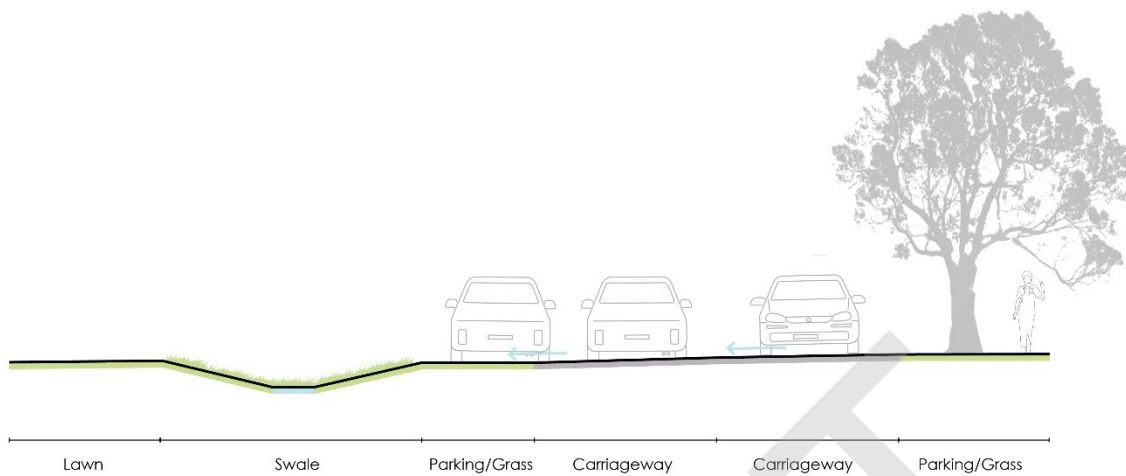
Potential roadside swale for stormwater conveyance and to encourage soakage.
